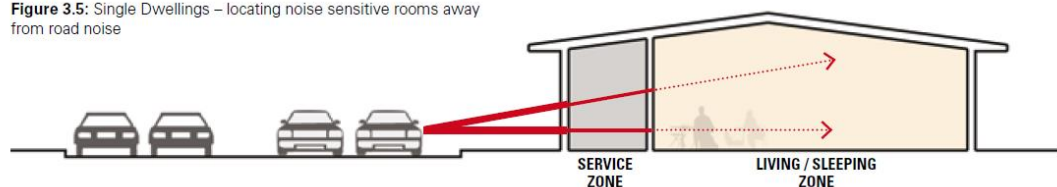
Sample of Building Layout Strategies 1 (NSW DoP, 2008)
